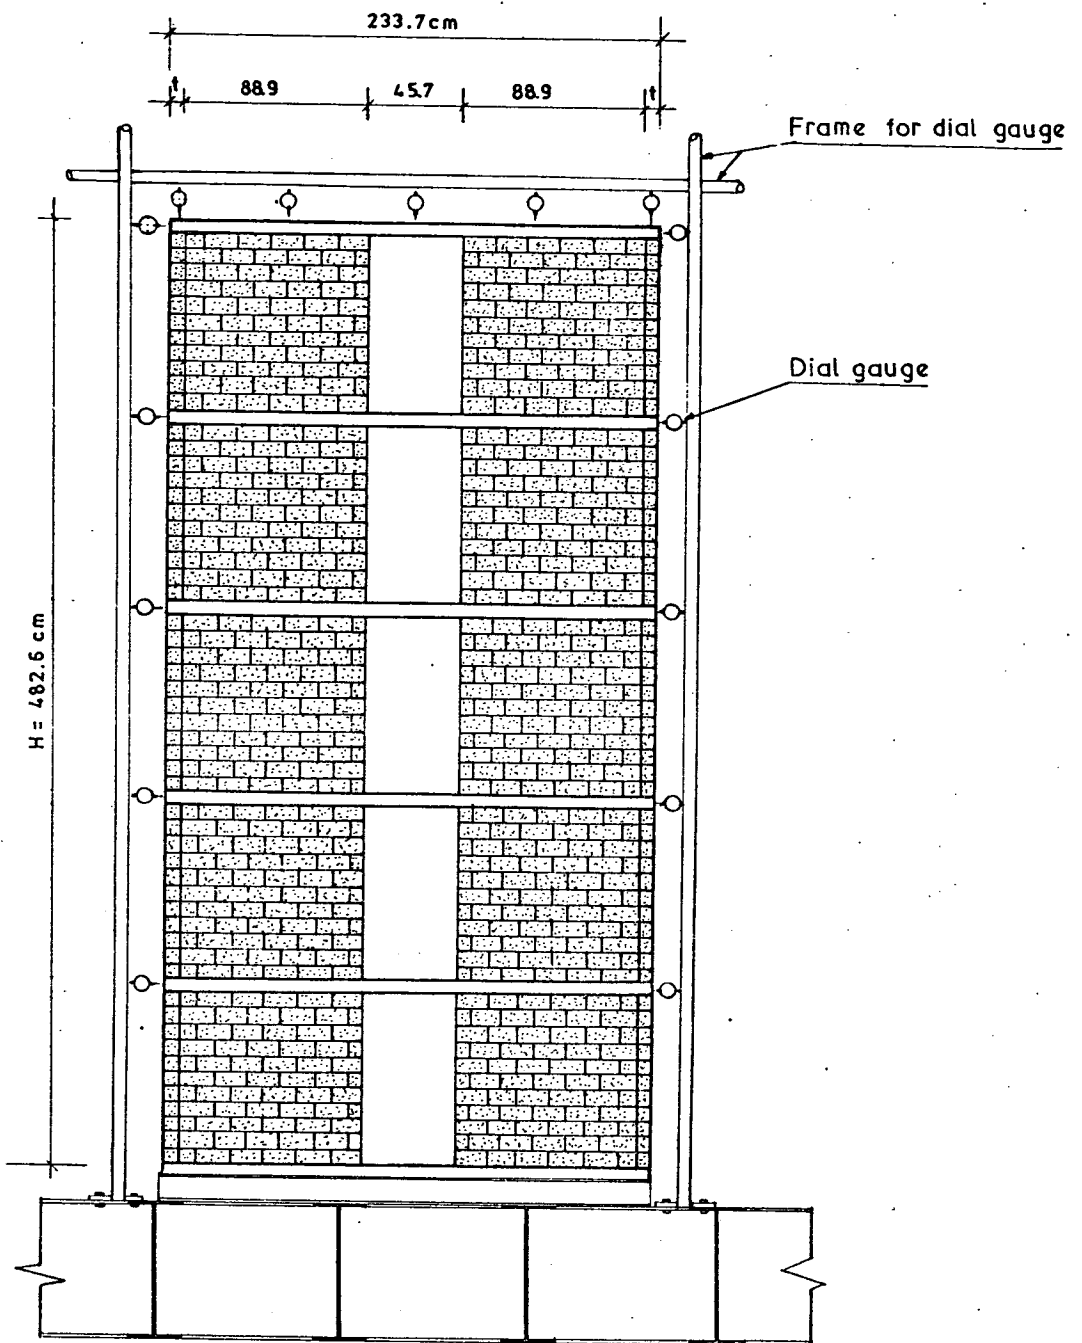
SIDE ELEVATION OF THE MODEL STRUCTURE
